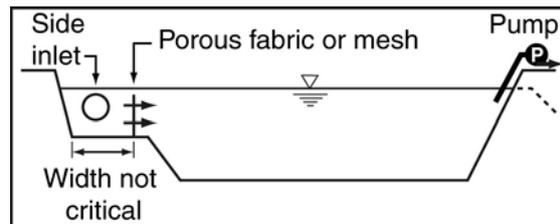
(b) – Typical layout of inlet chamber with side inlet (Type D basin)
